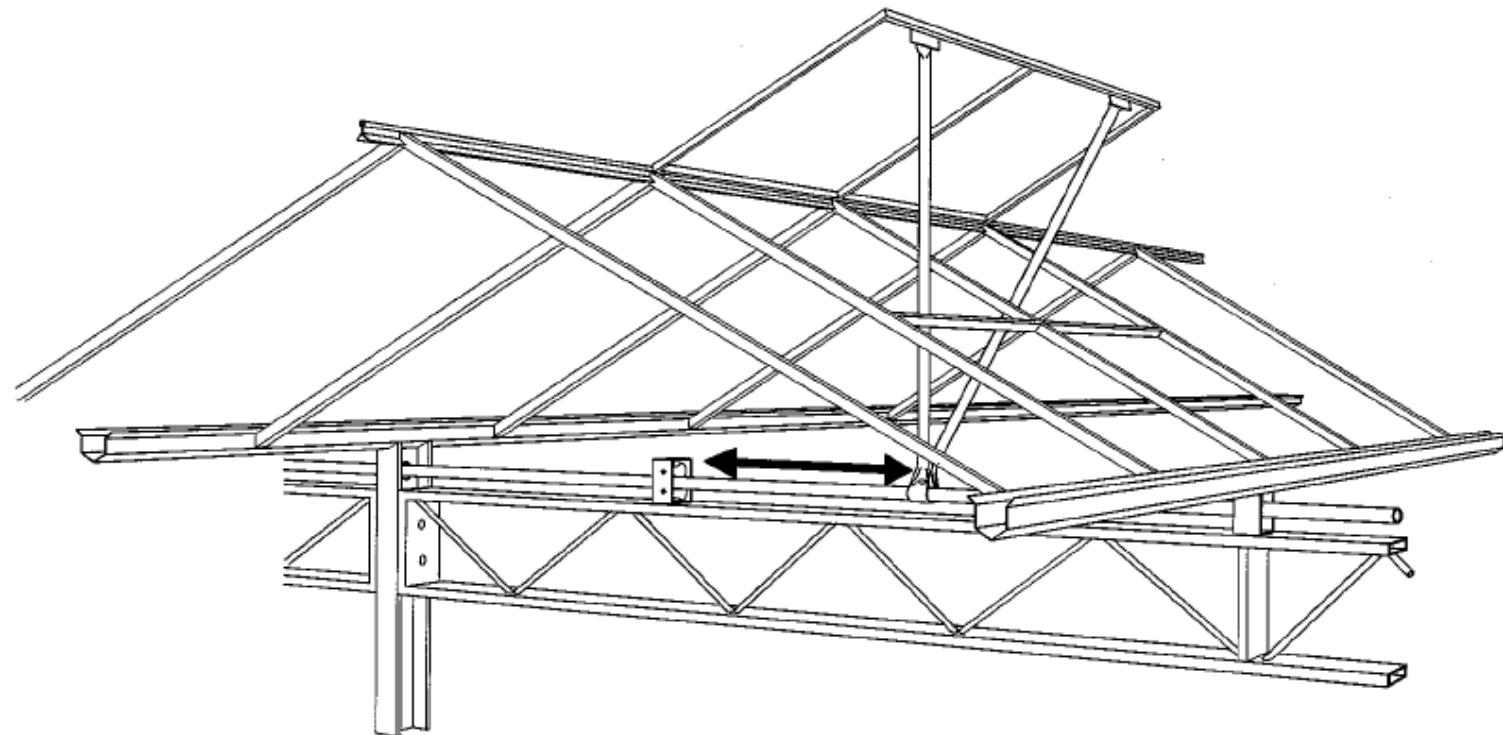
'Truss rail mechanism' for operation of ventilation windows in a Venlo-type greenhouse on top of the trellis girders
